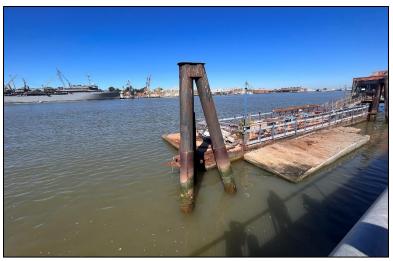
Existing ferry terminal infrastructure. Photo taken on July 25, 2023 facing west towards the Napa River.
